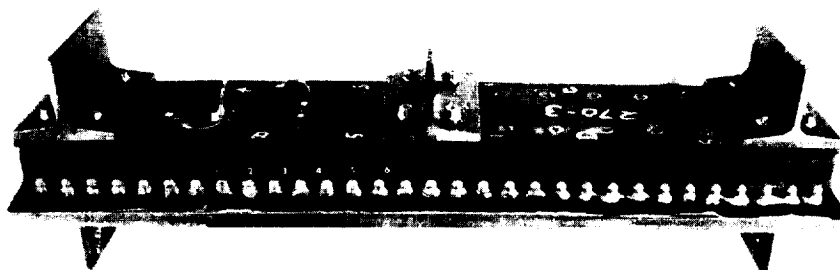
Bottom view of beam 270-2 showing by-pass fittings.
